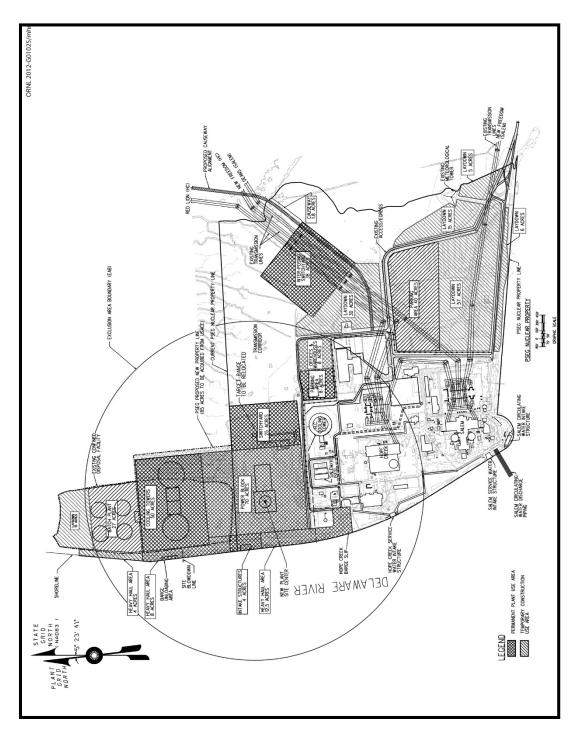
PSEG Site Utilization Plan (Source: PSEG 2012-TN1489)
